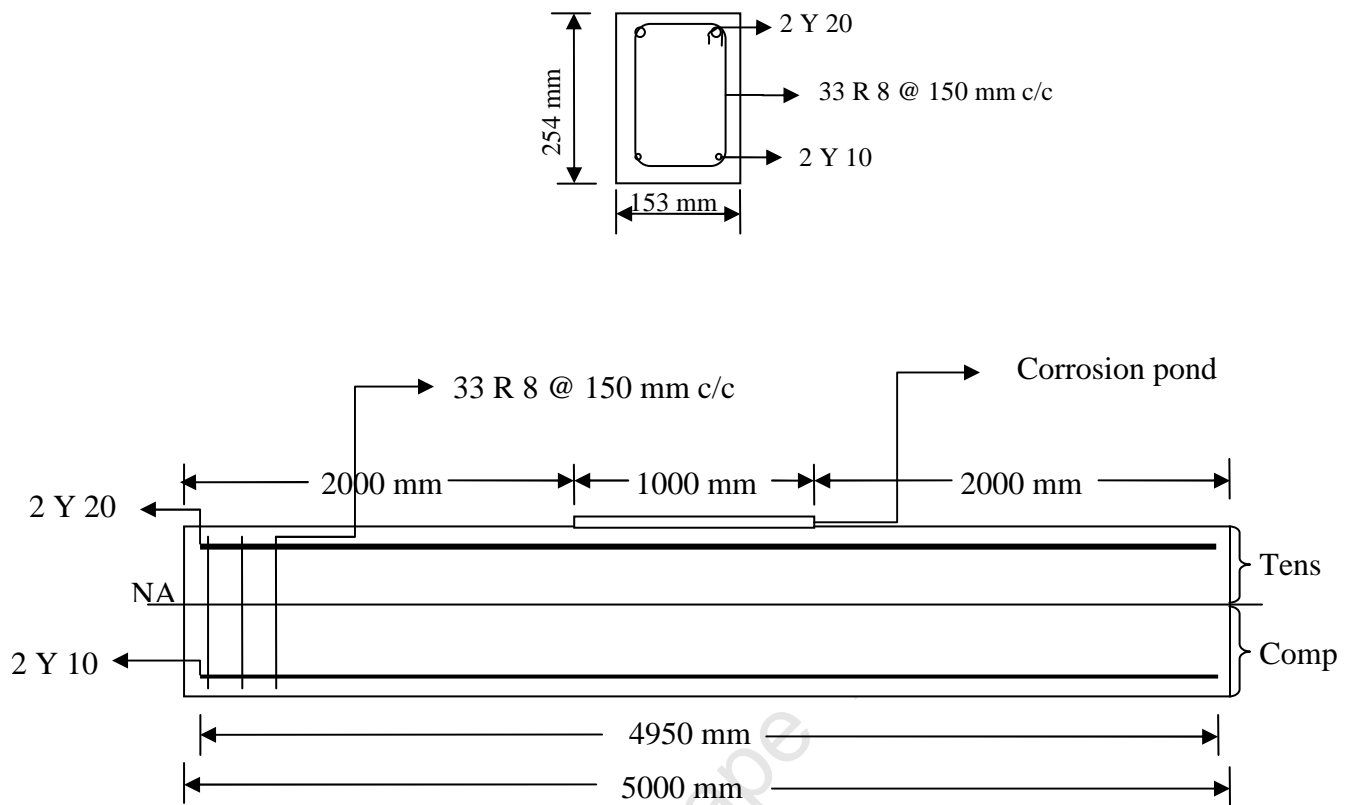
Inverted beam reinforcement detail (NOT TO SCALE)
